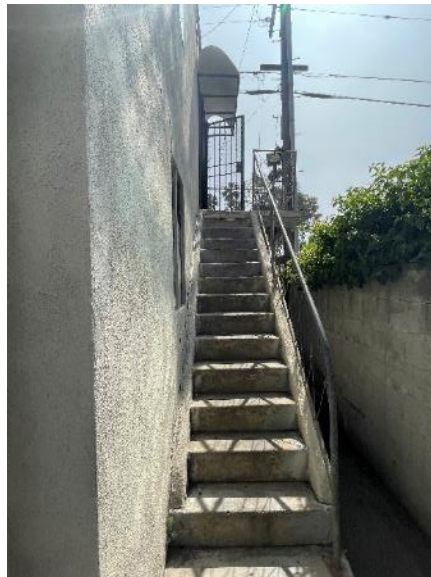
318/320 N. Oxford Avenue Additional Building Side Entry and Staircase (view east)
